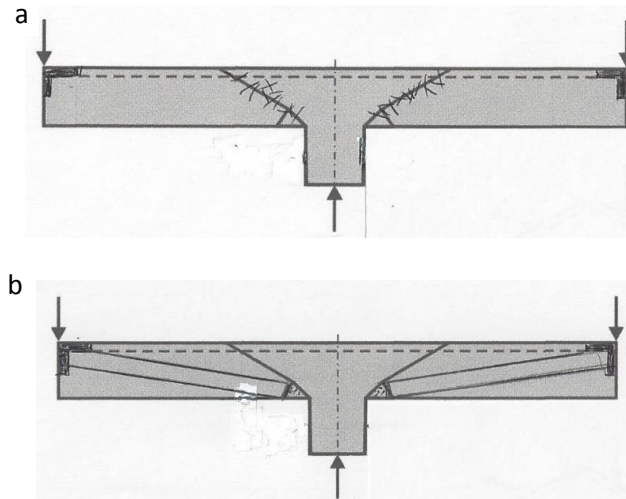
Cross-section through a circular slab element with steel fibres acting as punching shear reinforcement (a), the unexpected effect of compressive membrane action, dominating the behaviour (b)
